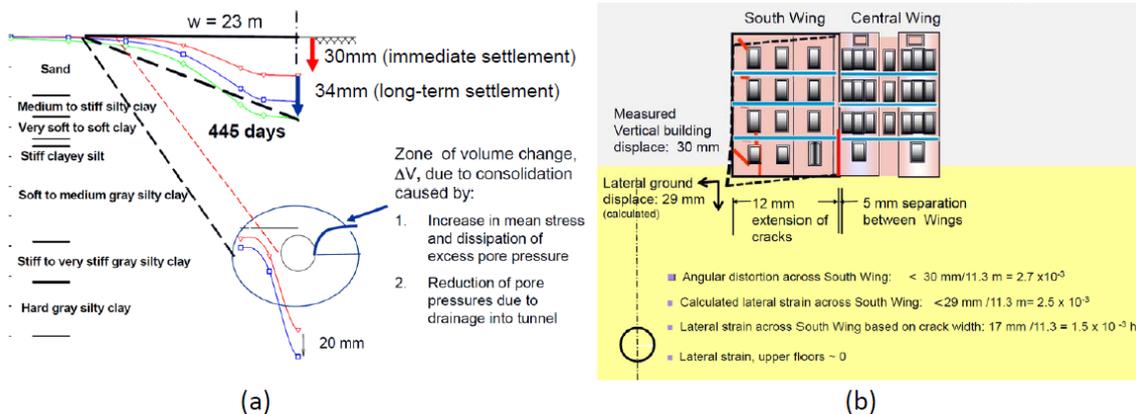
Consequences of tunnelling on buildings in Evanston. (a) Settlement trough. (b) Damage on a neighbour building (Cording et al, 2008).
